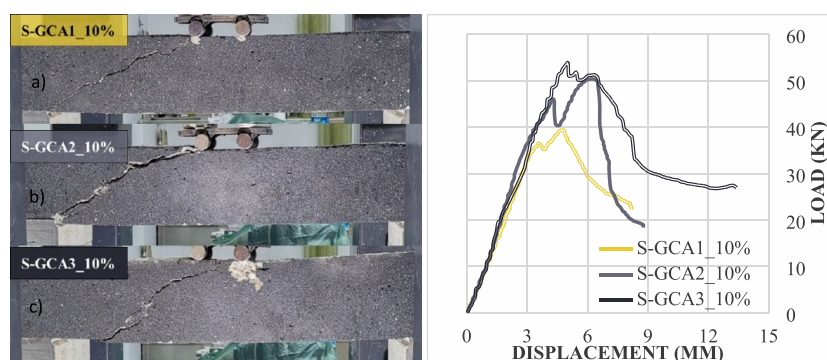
Assessment of failure patterns for 10% GCA with spacing of stirrup of (a) 270 mm, (b) 200 mm, and (c) 160 mm.
